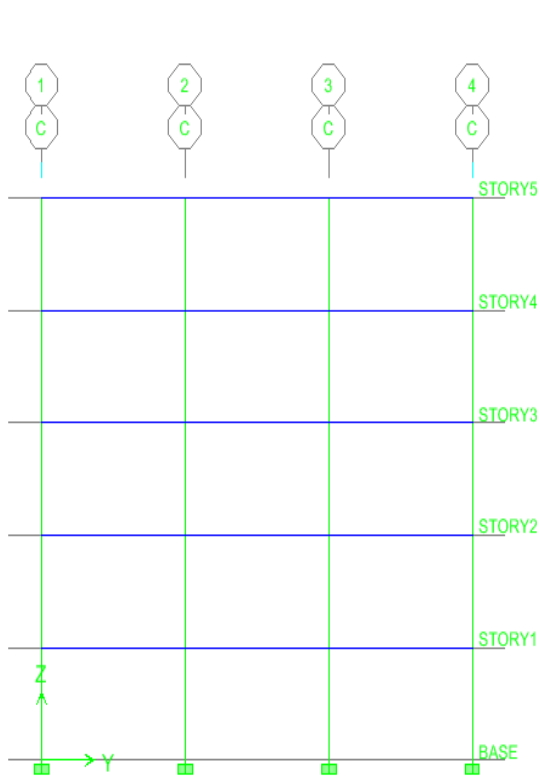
Model Elevation of G+5 Storeyed Building without Walls
